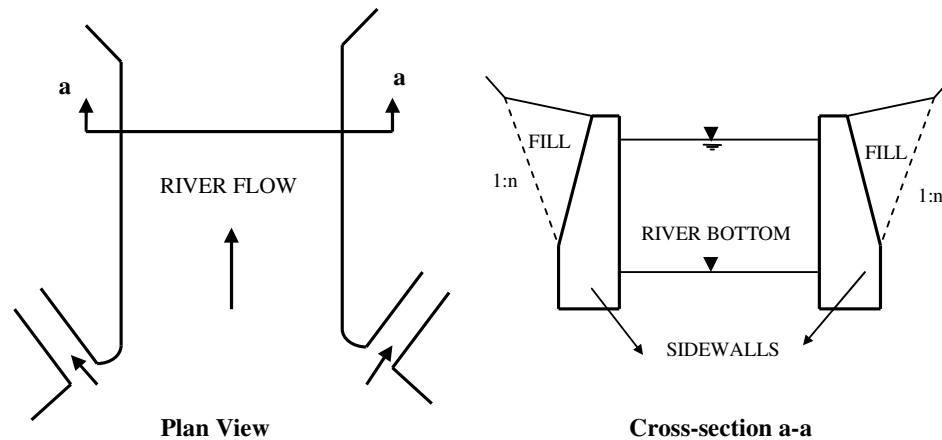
Plan view and cross-section of sidewalls (Yanmaz, 2001).
